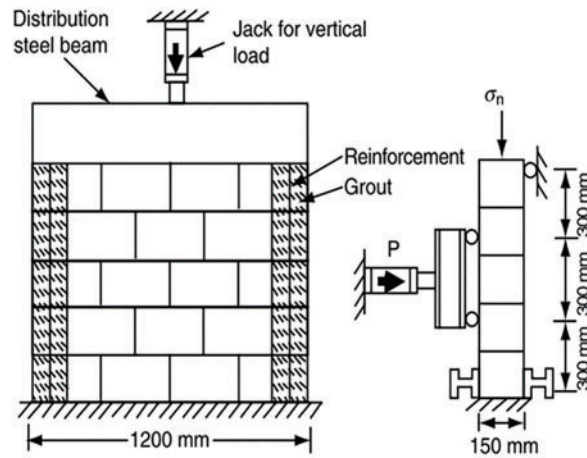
Test set-up of interlocking masonry wall under OOP load with precompression load [85]. Adapted with permission from Ref. [85]. Copyright ©2011, Sage
